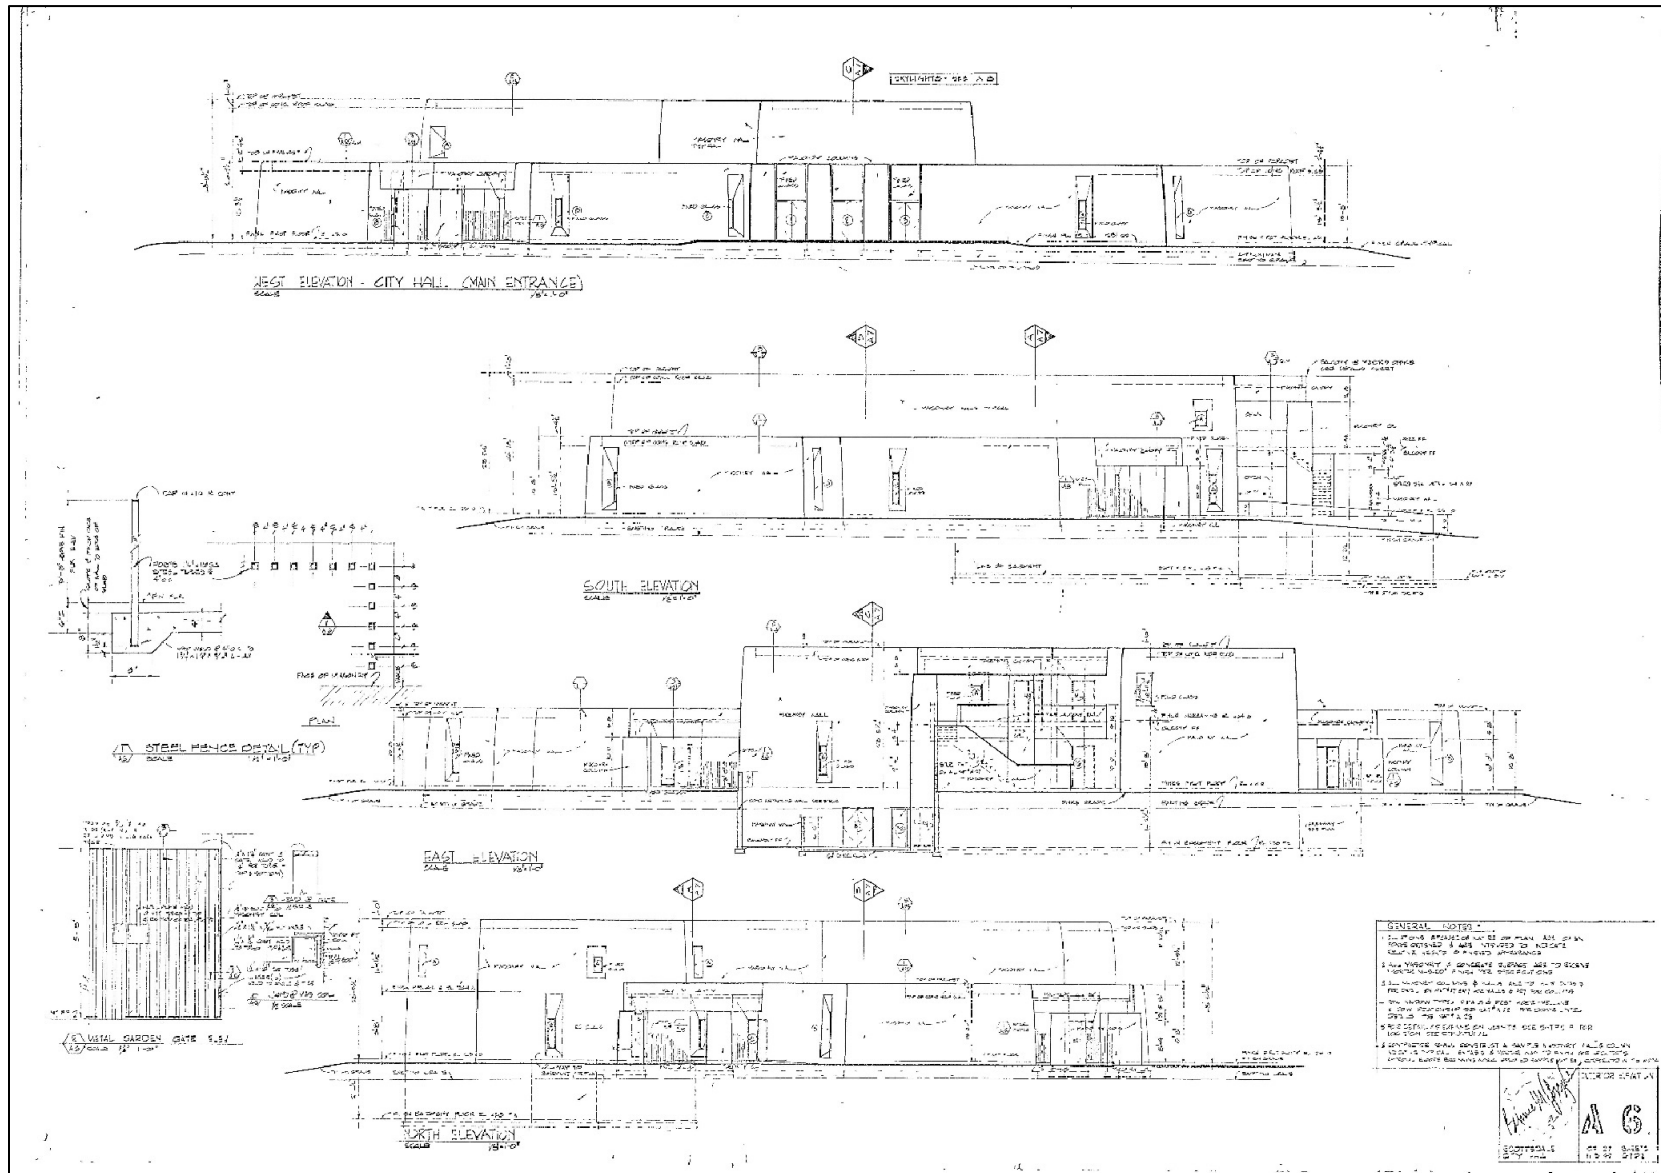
Original architectural drawings depicting the irregular massed elevations of the building (Scottsdale Public Library)
